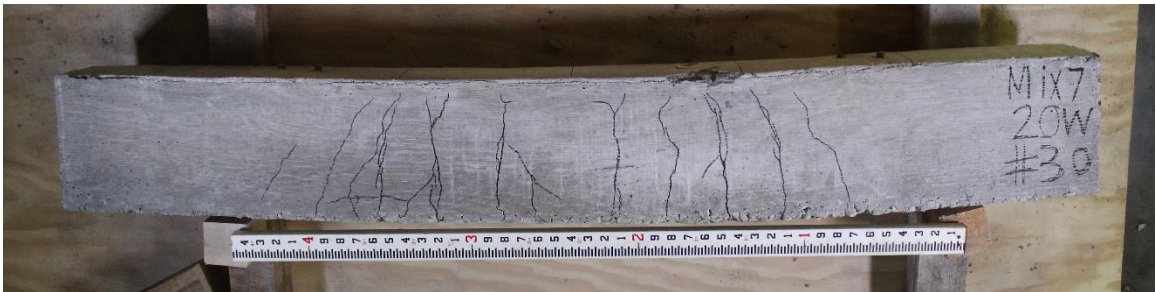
Mixture 7 (20W) beam #30: concrete beam side view.
